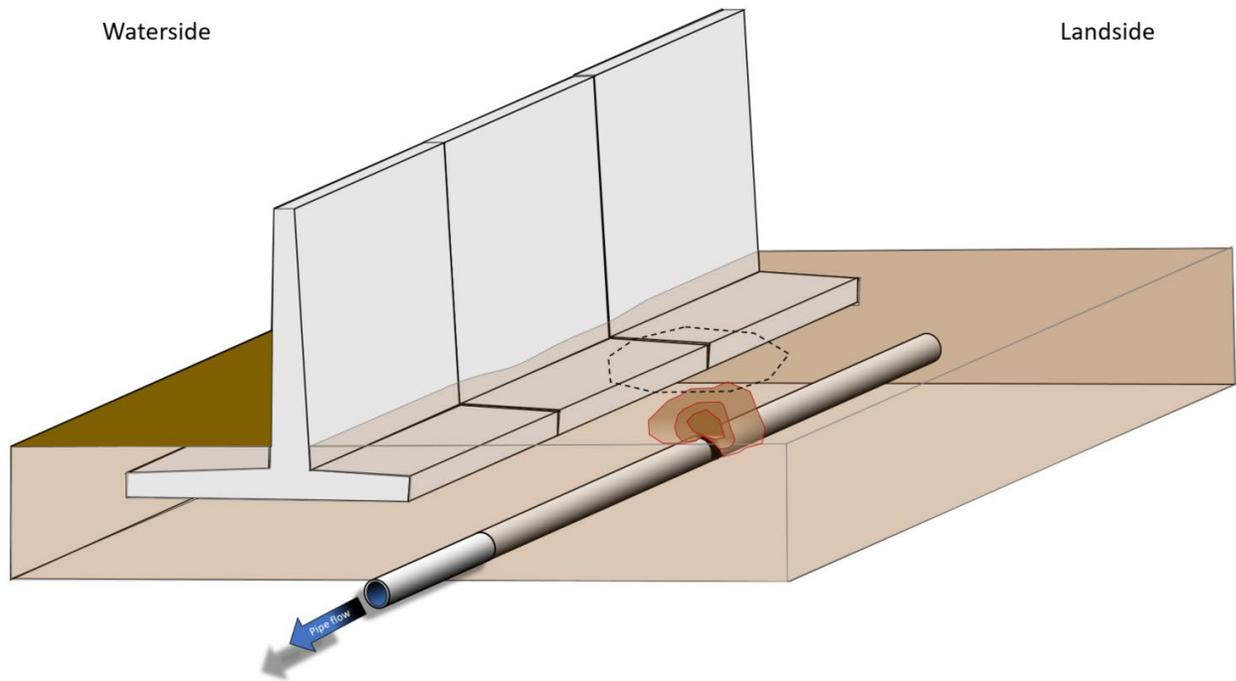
Continued soil loss removes supporting soil below and next to floodwall monoliths.
